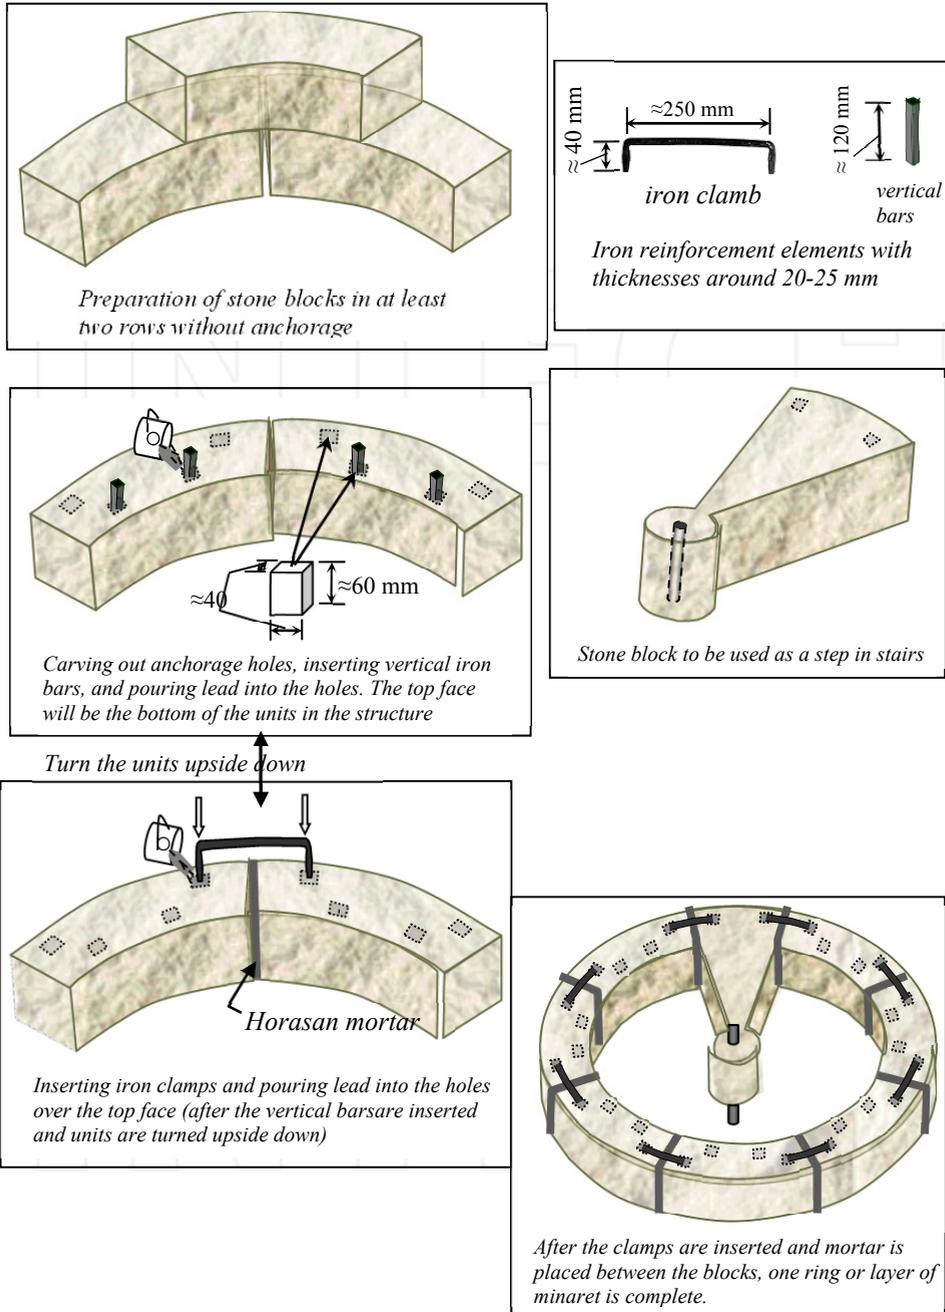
Construction of traditional Turkish minarets using stone blocks reinforced and anchored with iron bars and clamps (Dogangun et al. 2007)
